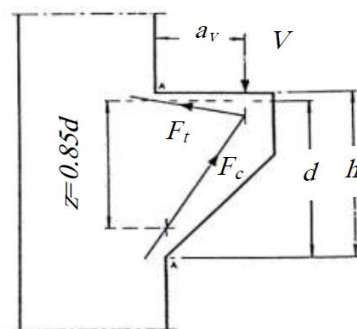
The present study concerns the loads and reinforcement of a typical reinforced concrete corbel.
